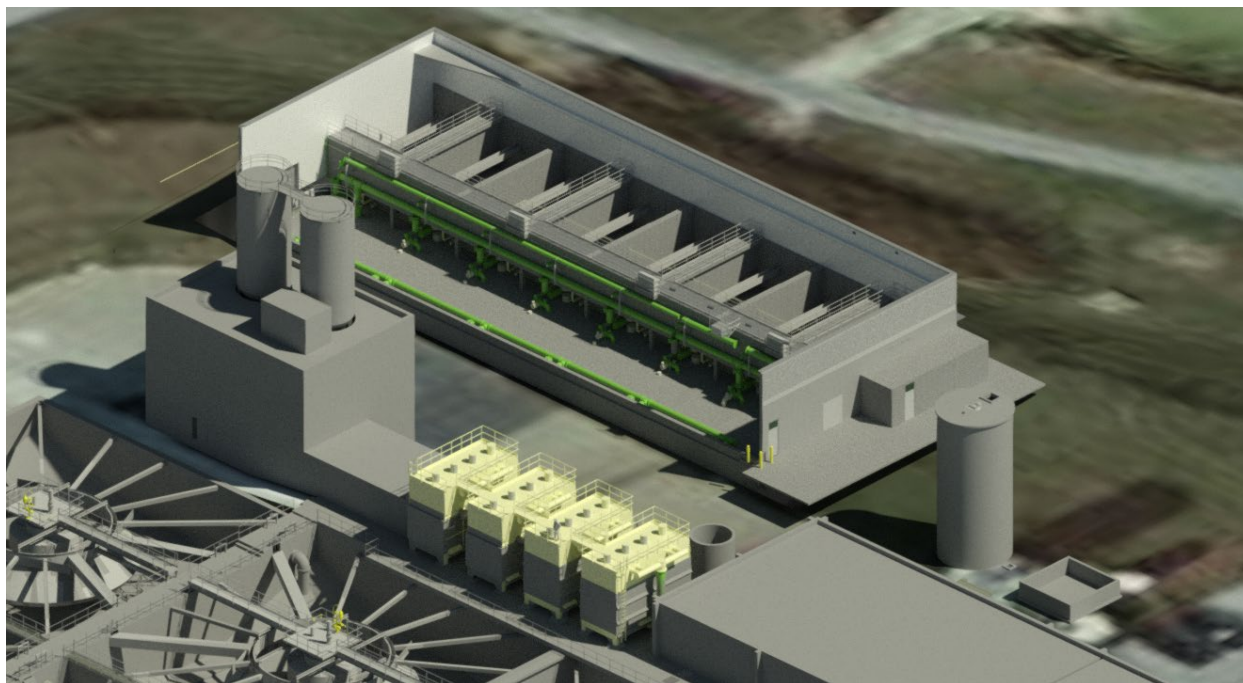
Conceptual Site Plan (GAC Contactor)
